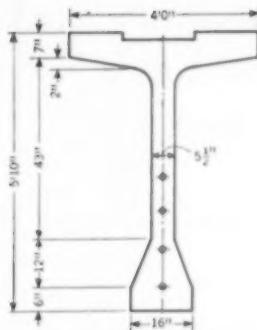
Precast prestressed deck beams have same section for all three bridges.
